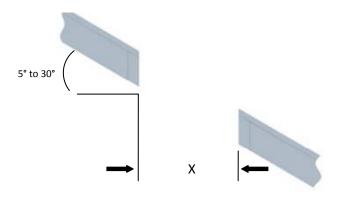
Minimum Opening Pitched (Sloped) Roof
